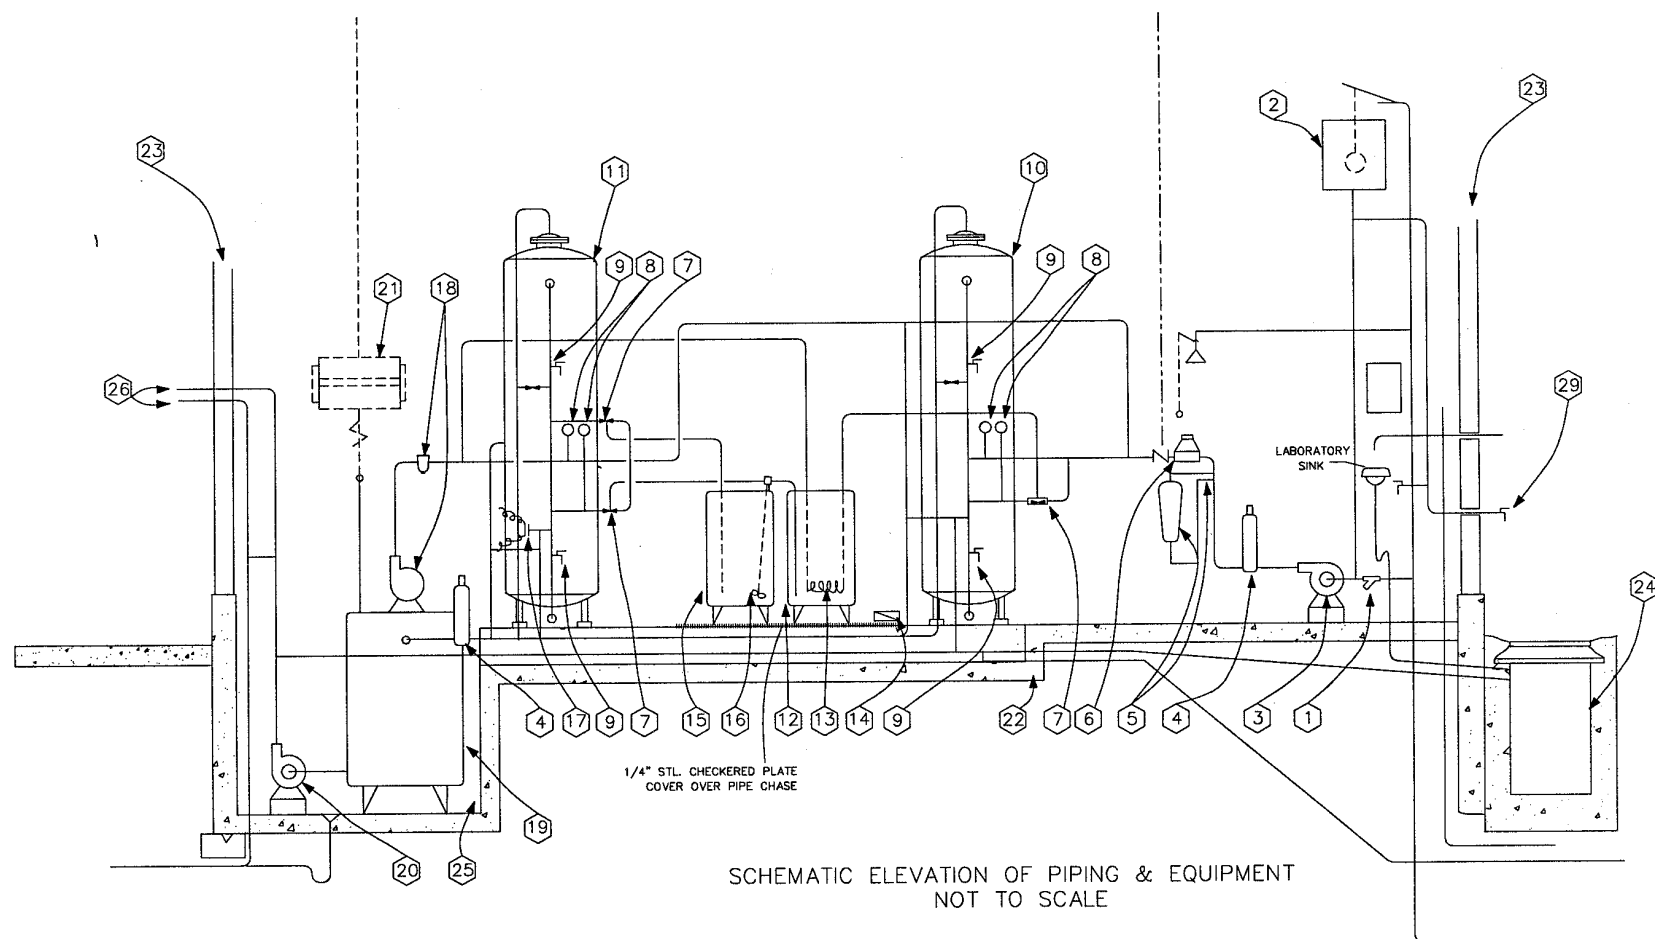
Building 594 Ion Exchange Piping & Equipment
